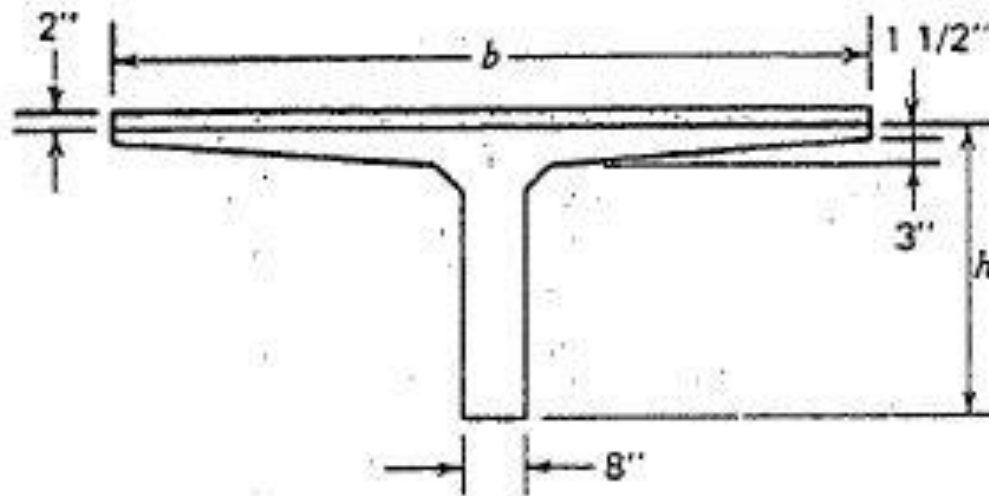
(a). Typical single-tee section (Lin Tee).
